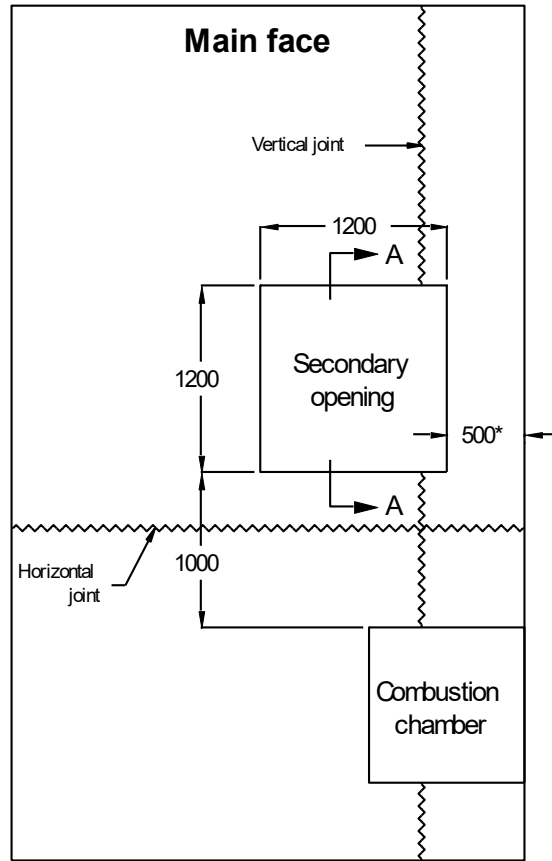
Main face with secondary opening including the location of vertical and horizontal joints. Distances in the drawing shall be considered with a tolerance of ± 50 mm except the vertical distance between corner and secondary opening which is 500 ± 100 mm.
